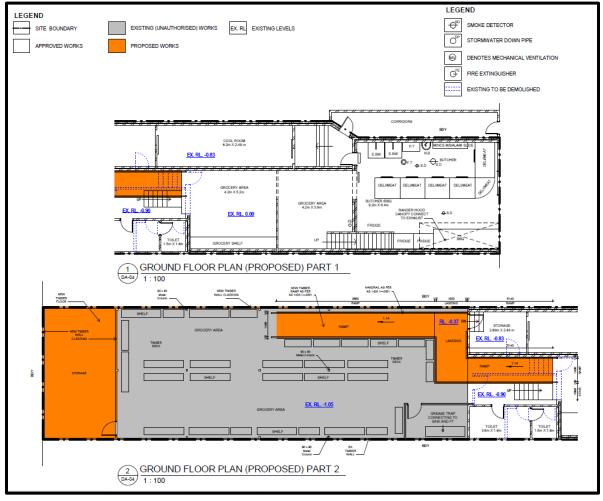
Proposed Ground Floor Plan (Source ADA Design) ``.
